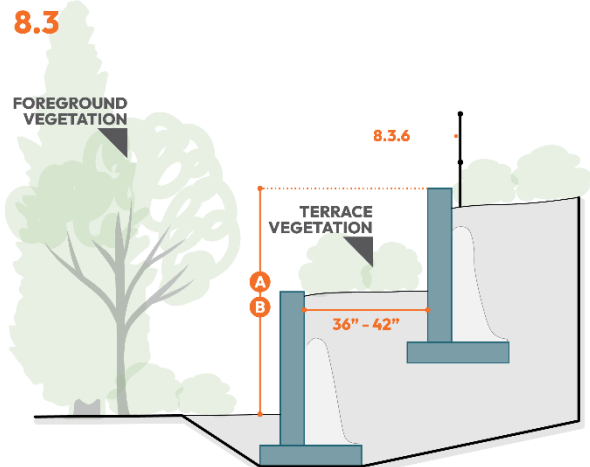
Retaining Wall and Wall System Design-Cast In Place
